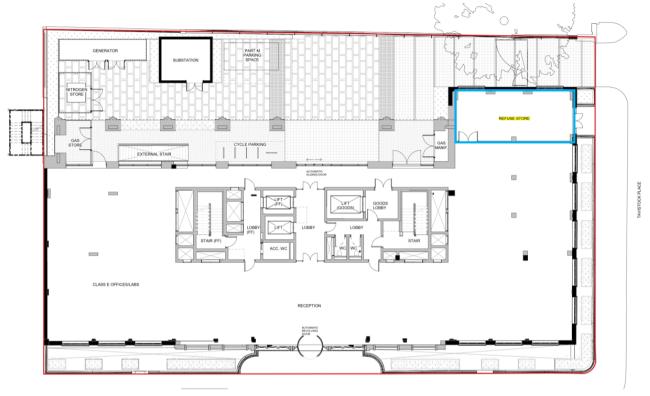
Ground floor layout showing the location of the refuse store, source Gort Scott
